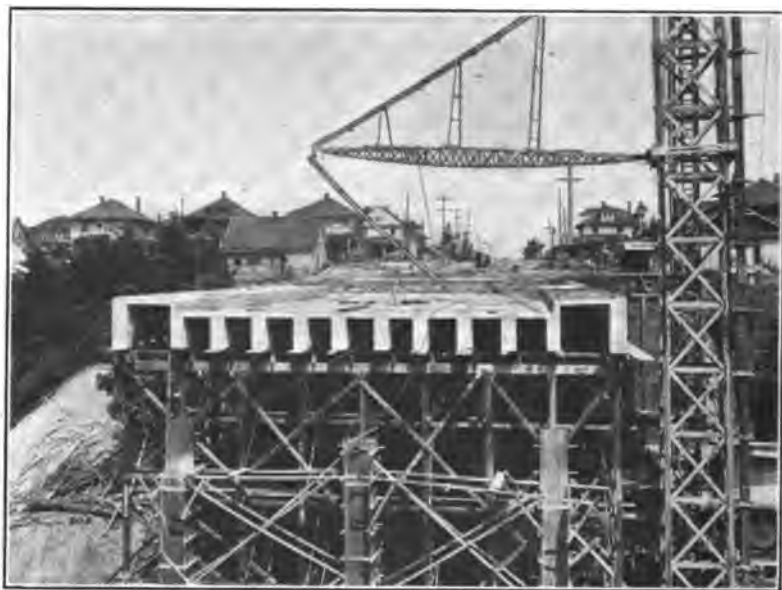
DISTRIBUTING BOOM ON SPOUTING PLANT, PORTLAND, ORE.
